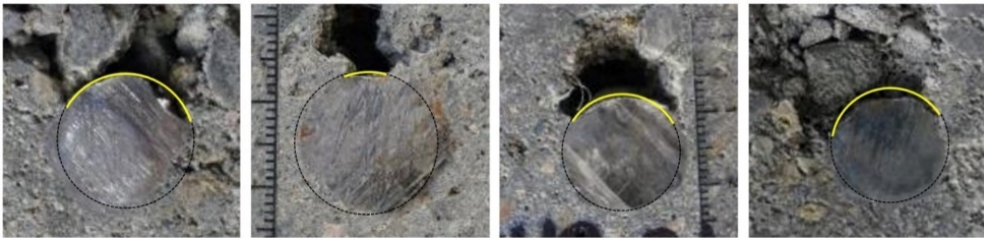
Typical shotcrete imperfections behind reinforcing bars
